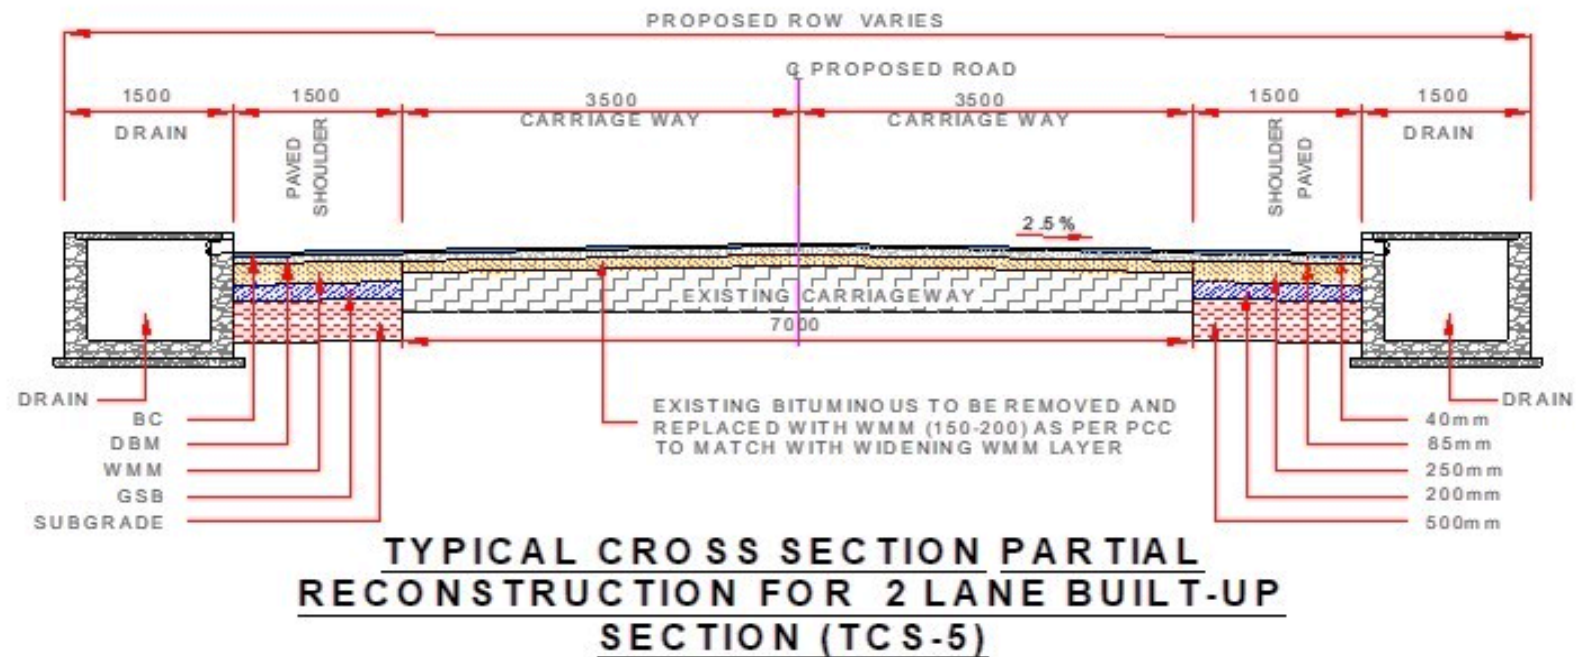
Typical Cross Section for Partial Reconstruction for 2 Lane Built up Section (TCS-5)
